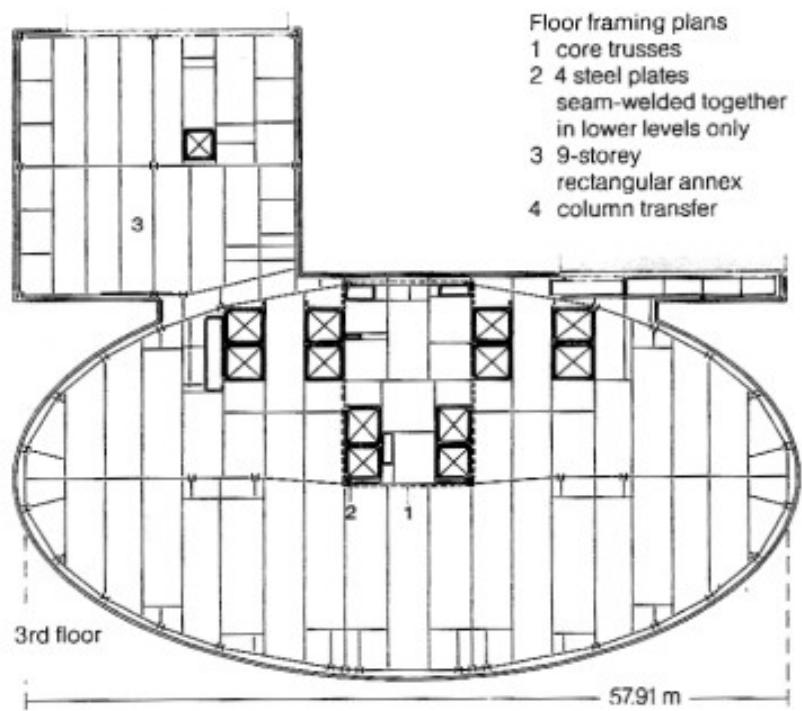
The floor plan of 53<sup>rd</sup> at Third building.
